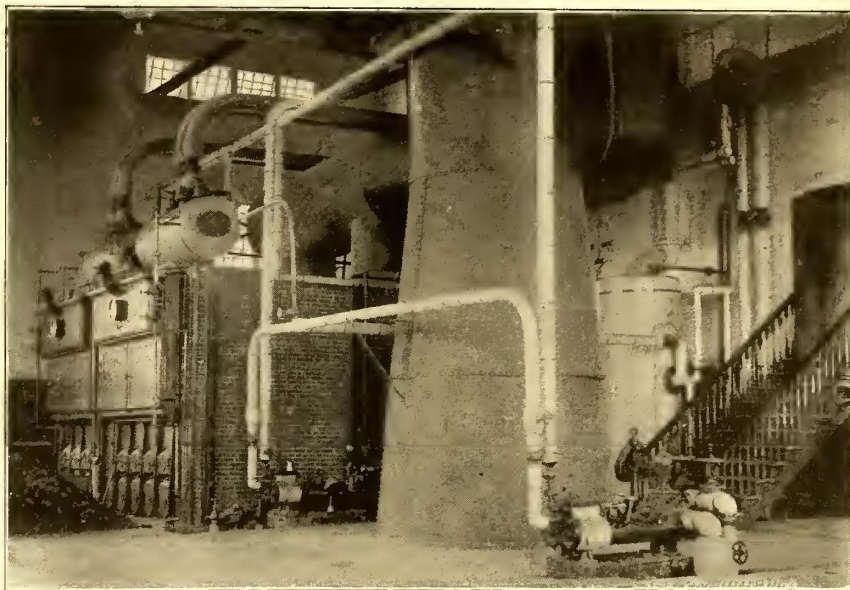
INTERIOR OF BOILER ROOM, ORLEANS RAILROAD, SHOWING LEADERS FEED PUMP AND PIPING, STACK STUB, ETC.
